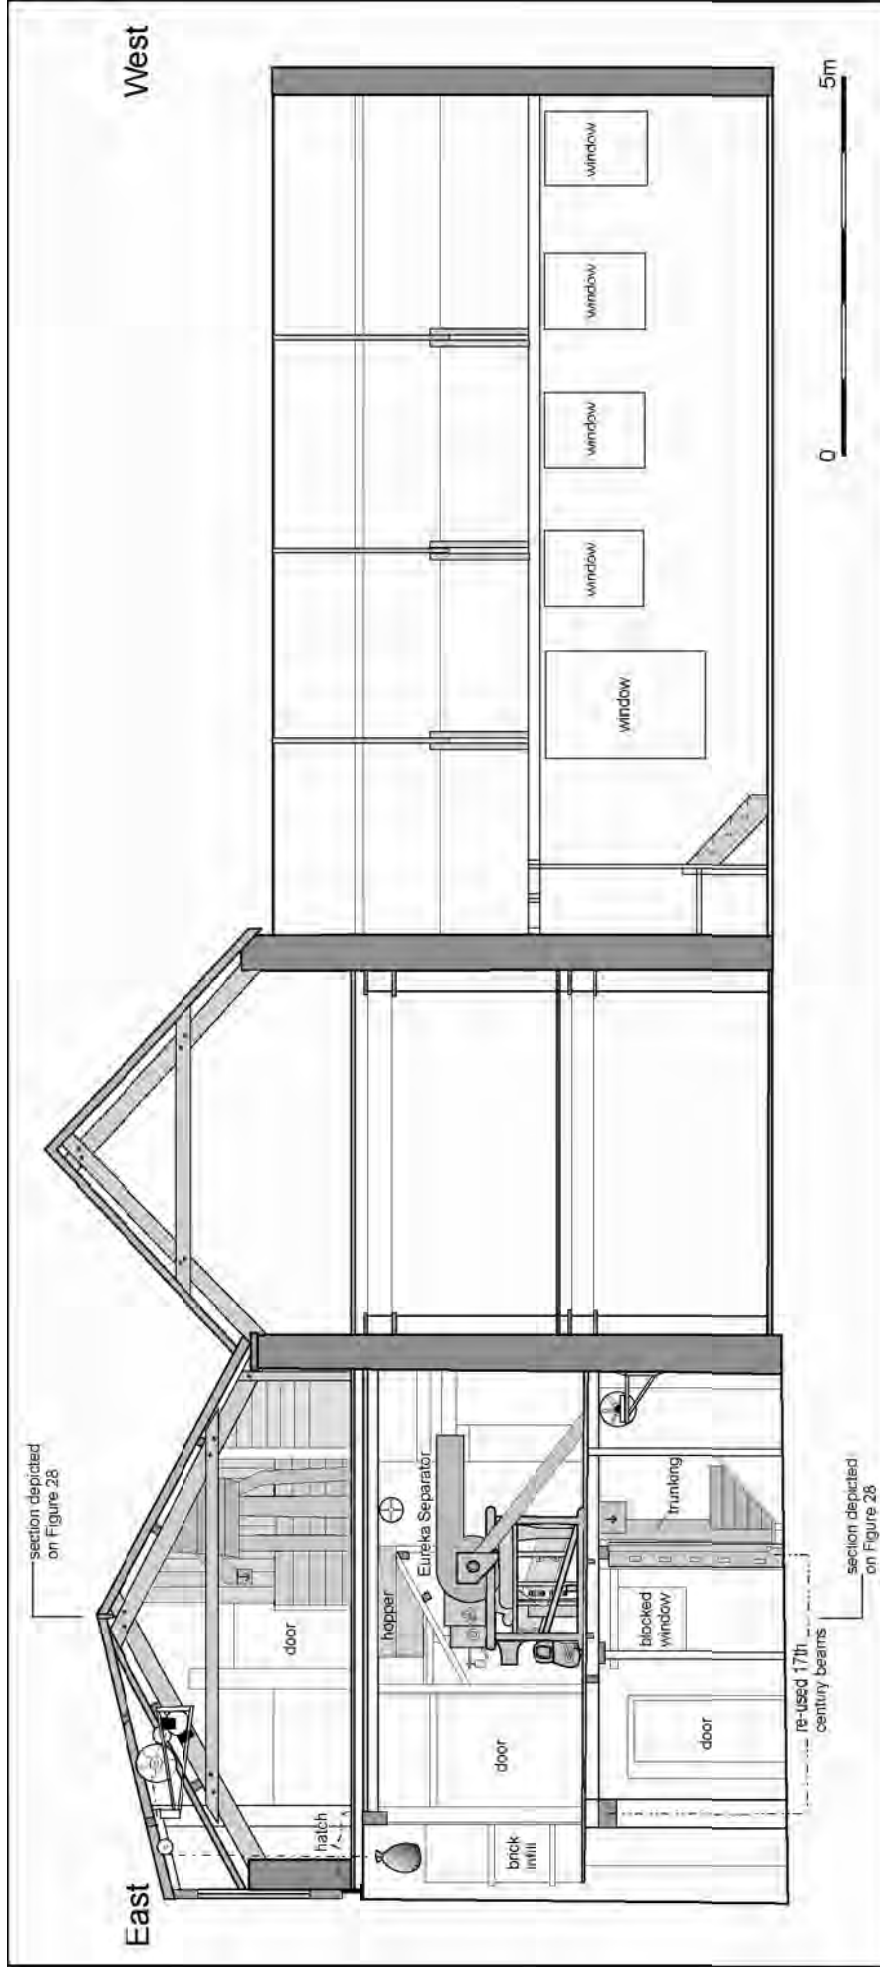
East-west cross-section through 26 Bear Street (see Figure 29).
